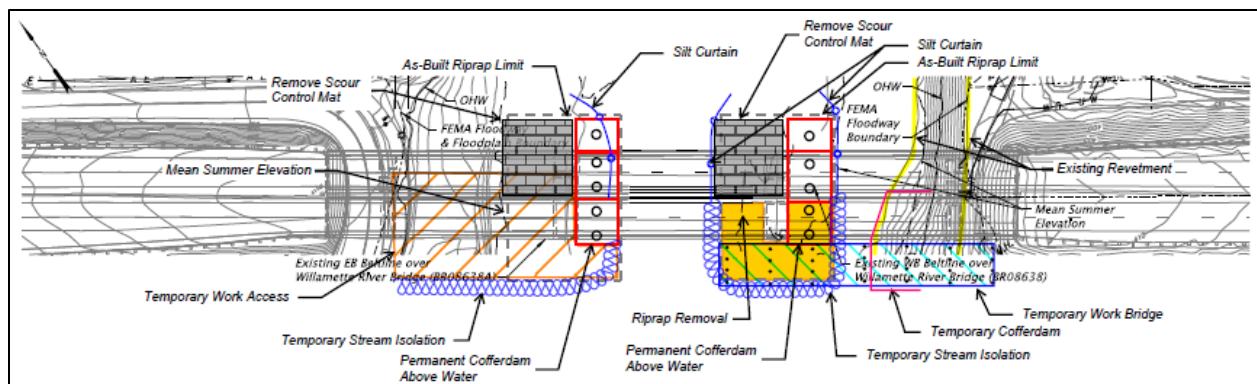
Willamette River Beltline Bridge reconstruction plan view.
